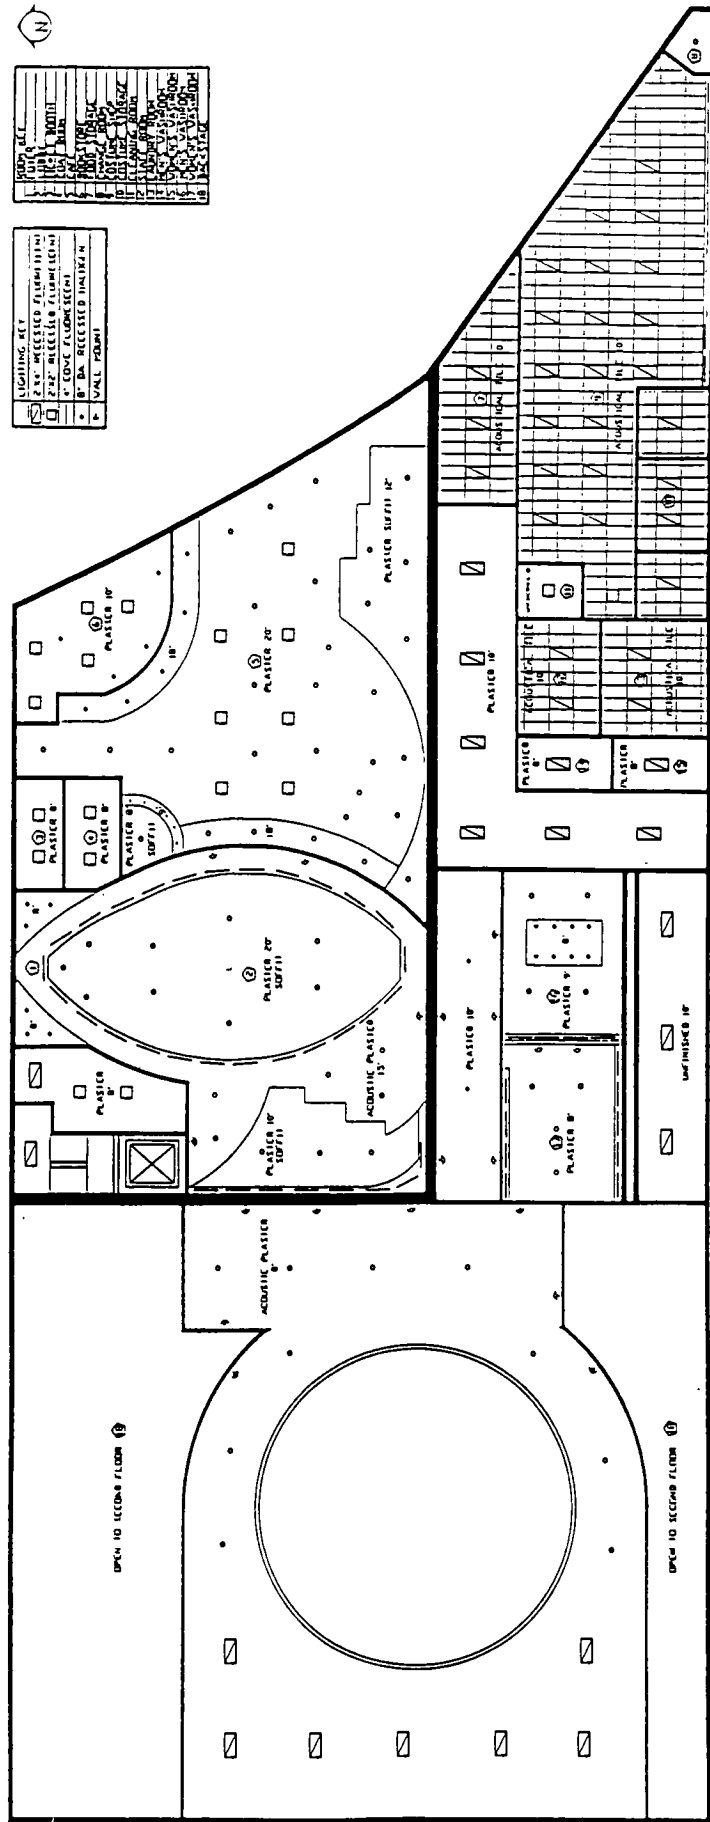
; Reflected Ceiling Plan of Caldwell Theater Complex
